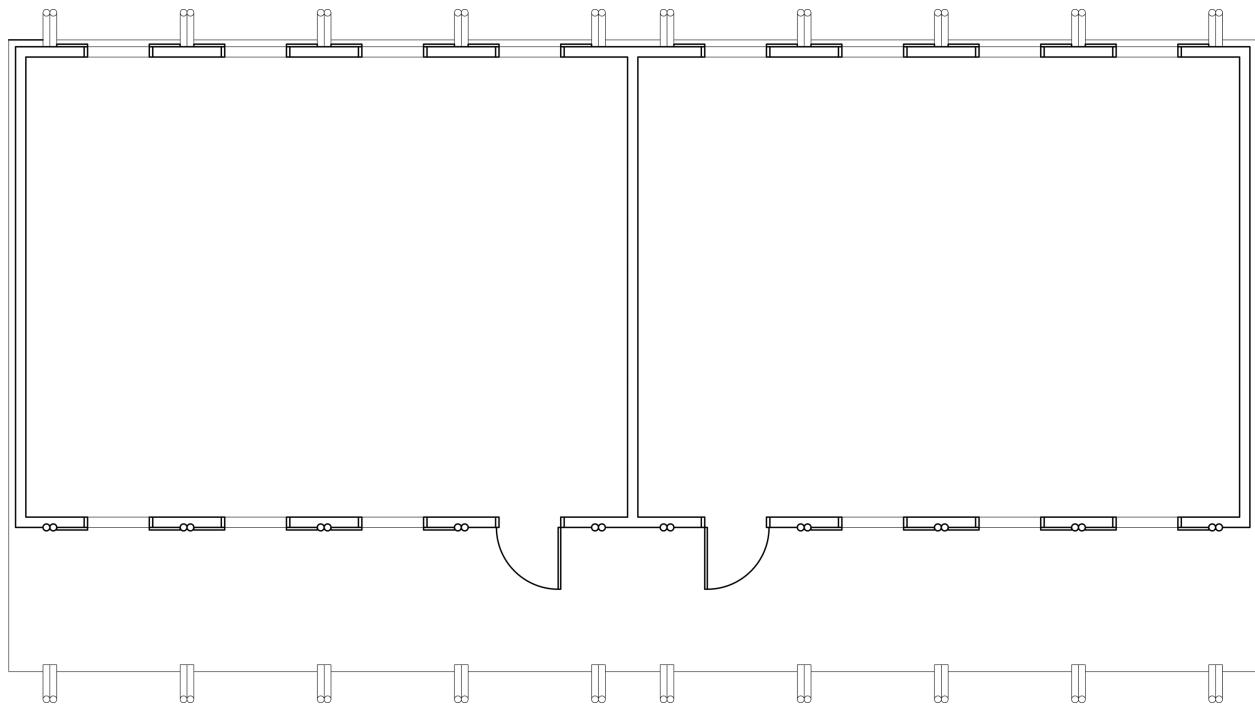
School floor plan. Windows are 1 m^2 and doors are 2 m^2 .
